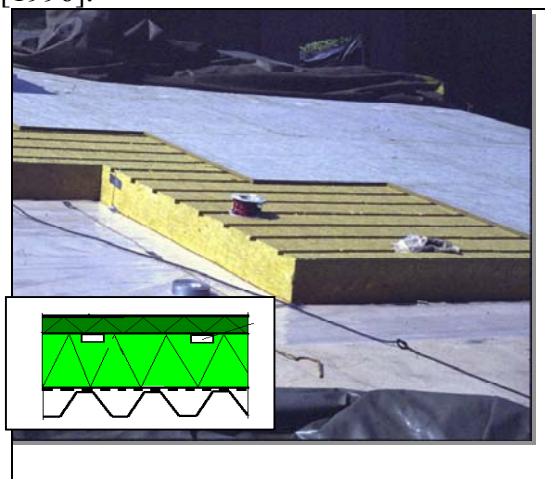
Low-sloped roof cross section. Ventilating insulation layer.
